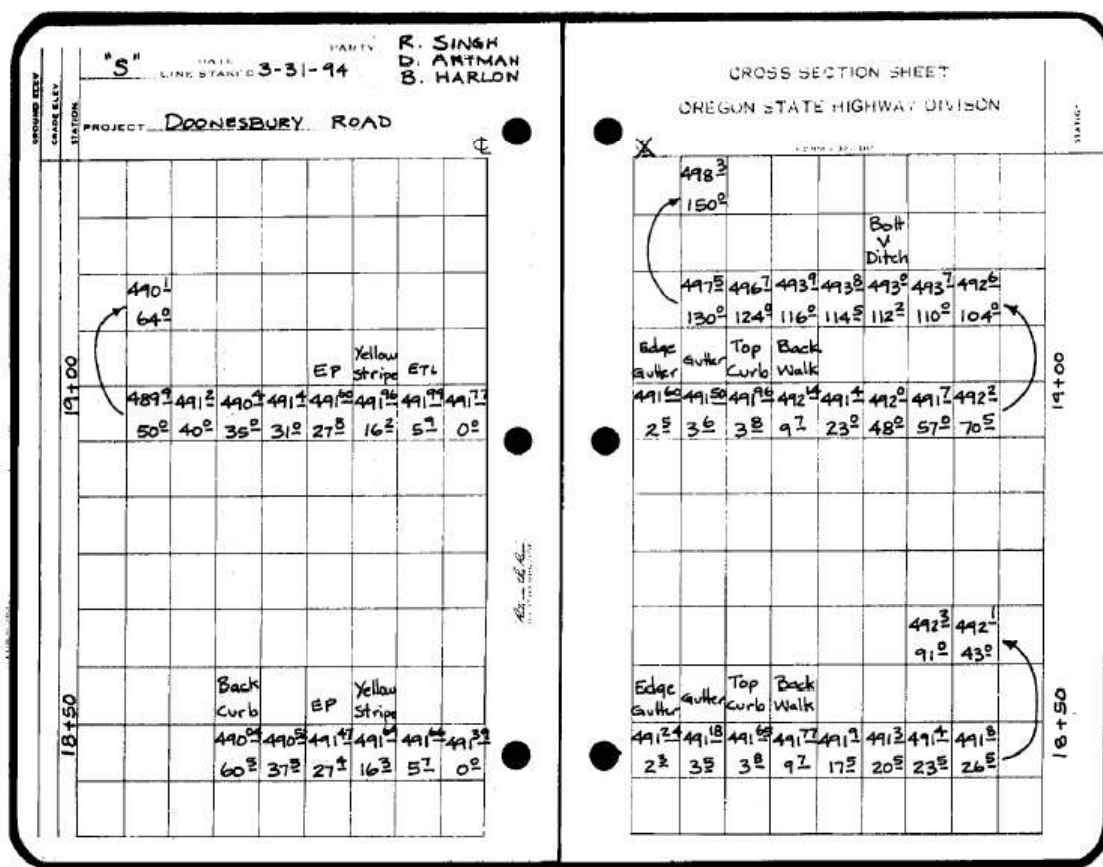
Example of field book notes showing location relative to centerline and elevation data from two cross-sections spaced 50-ft C/C (Oregon DOT 2000)
